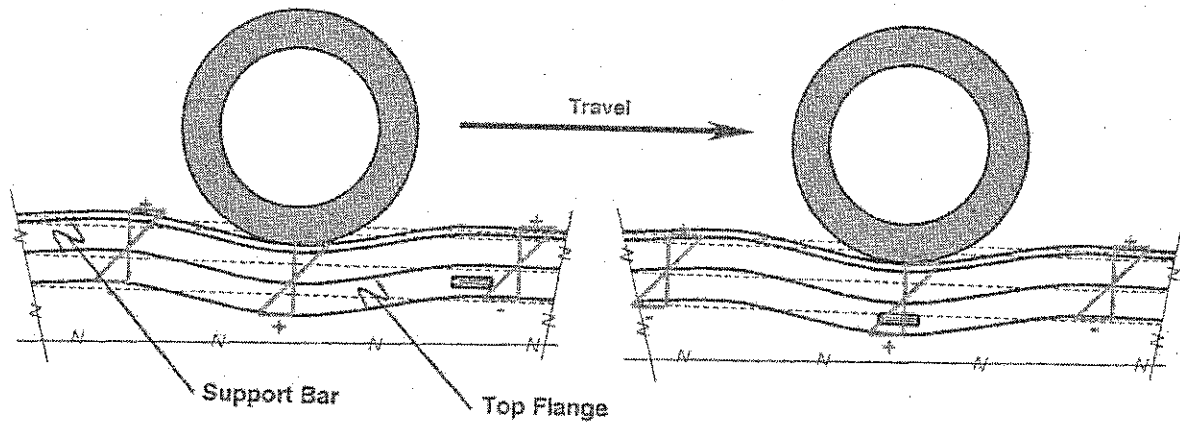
Local Bending in Top Flange Due to Wheel Load
